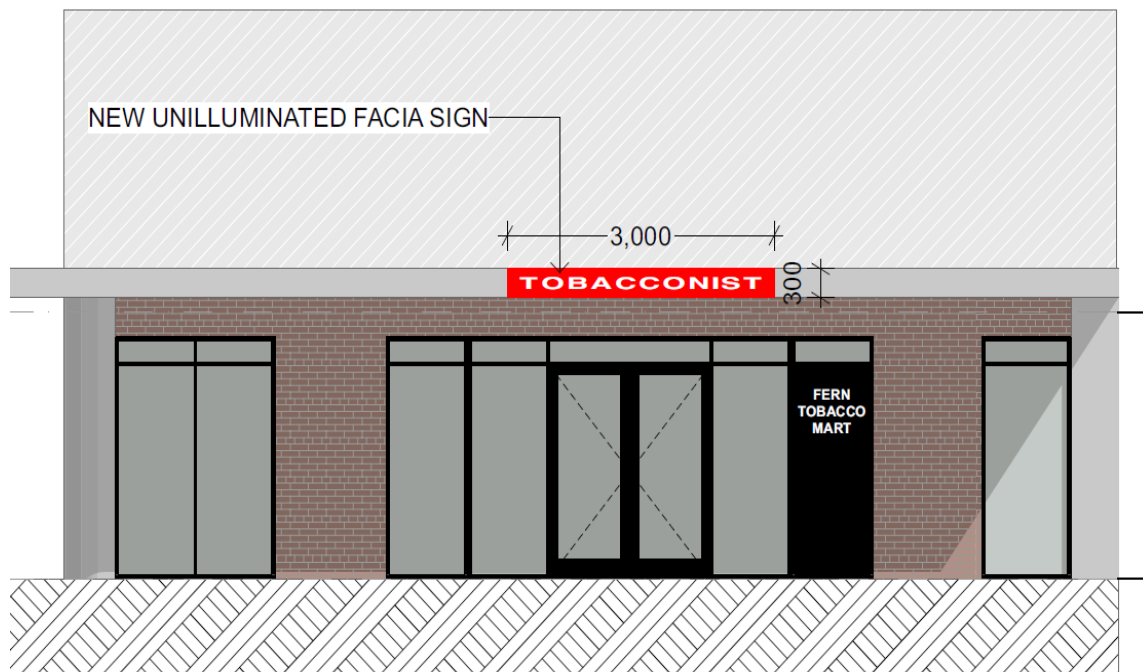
Proposed eastern elevation (viewed from Pitt Street)
